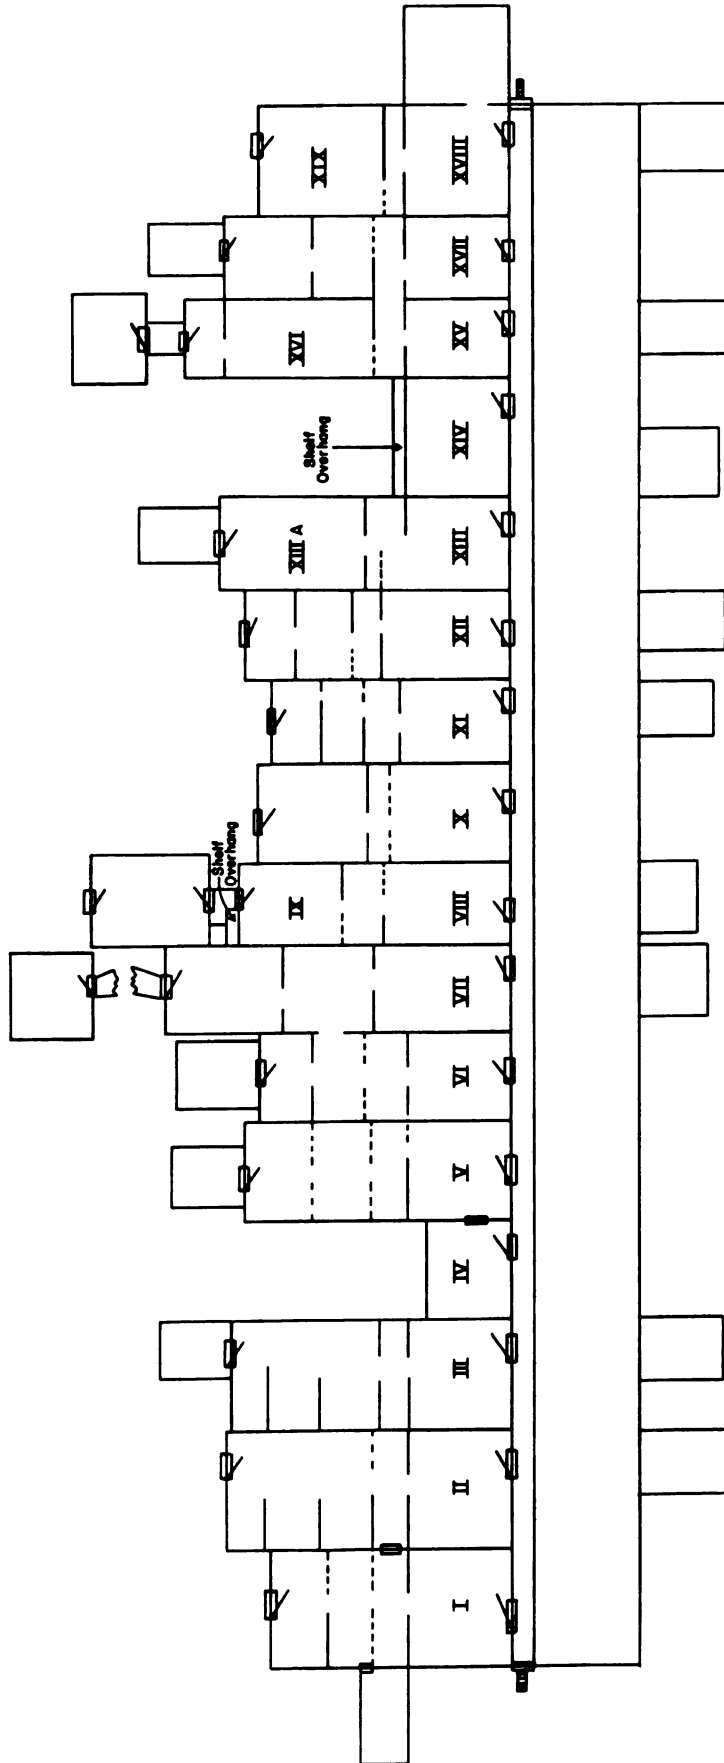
Residence Plan of the Longhouse at Sungai Mulau.
